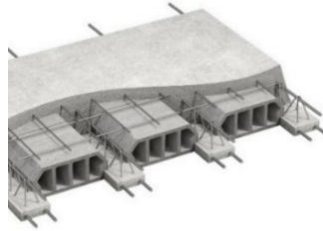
Layered concrete block-beam structural system (Universal Slab, 2024)
